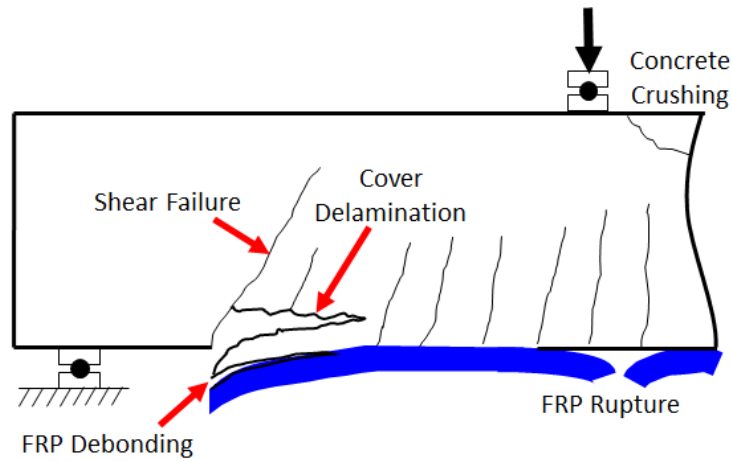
Most common failure modes for FRP strengthened concrete beams [53].
